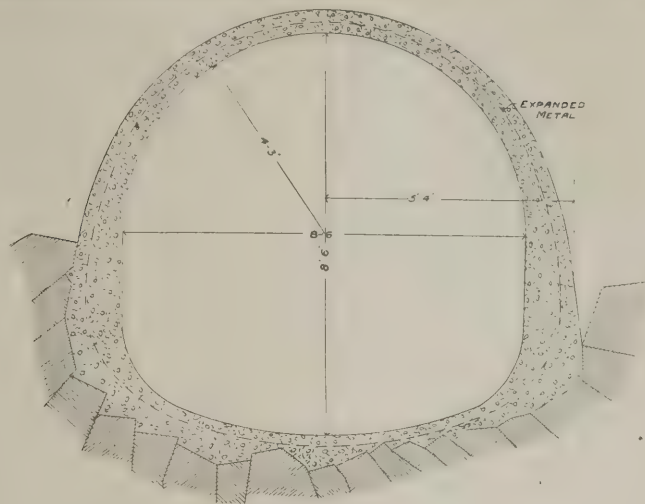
SECTION OF REINFORCED CONCRETE WATER-SUPPLY CONDUIT FOR JERSEY CITY.
